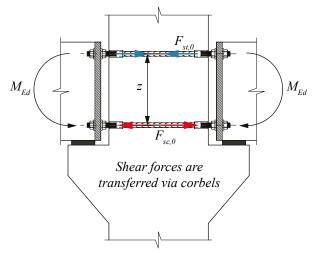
Structural behavior of anchoring couplers in double-sided connections.
